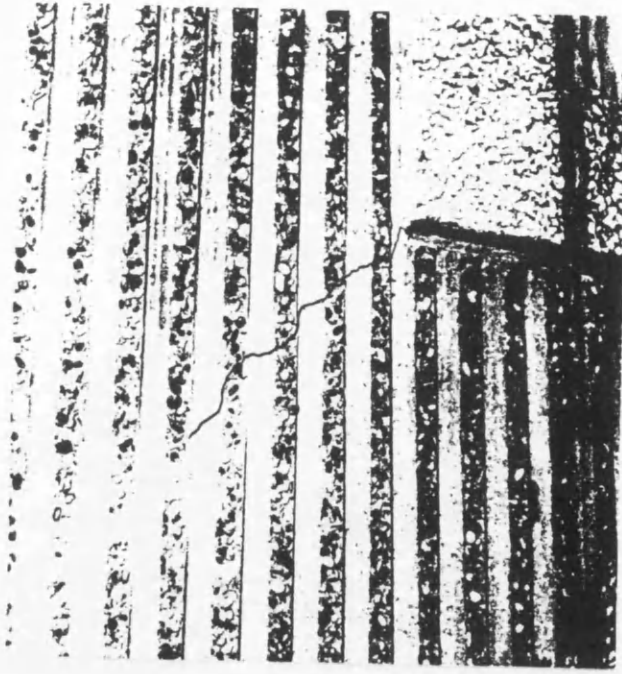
Diagonal cracking originating from corner of window opening.
